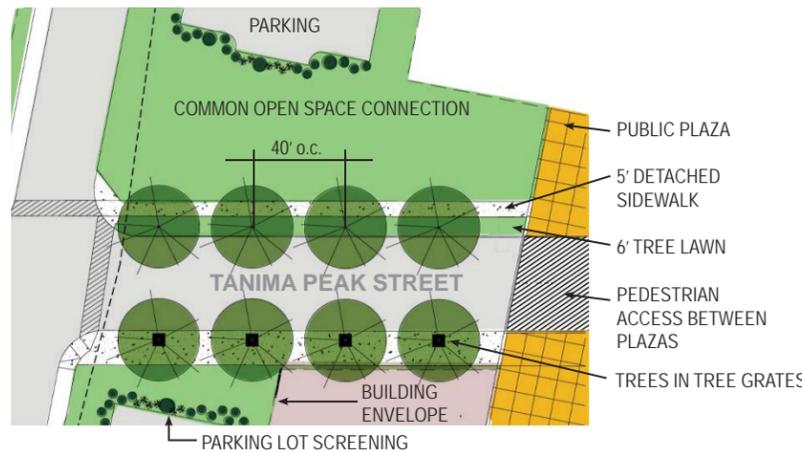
Tanima Peak Street Landscape Treatments, Plan View
